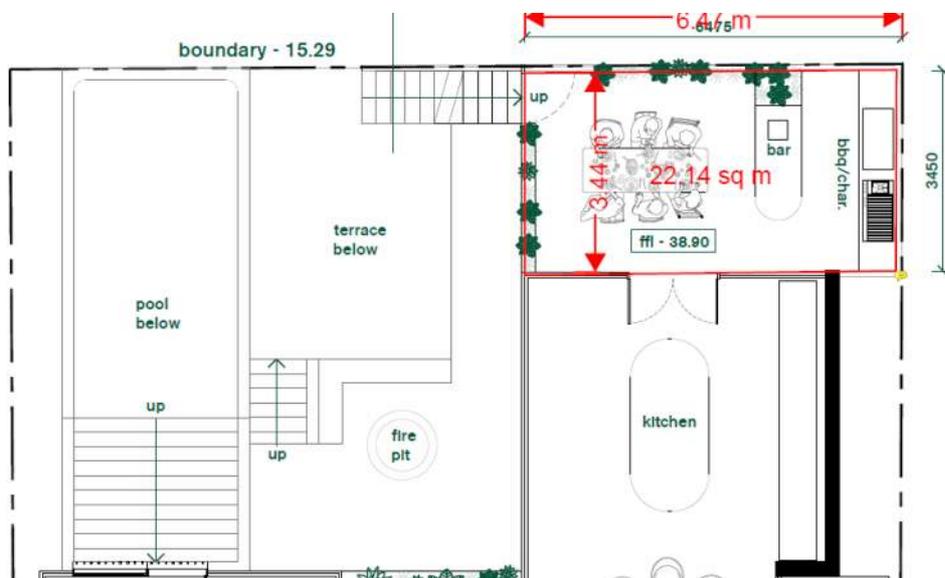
Extract from applicant's plans illustrating outdoor area on third level.
